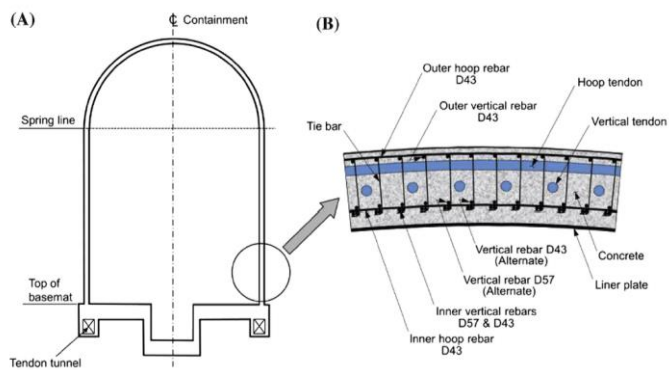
Wall reinforcement. (A) PCCV. (B) Reinforcing bars. PCCV, prestressed concrete containment vessel.
